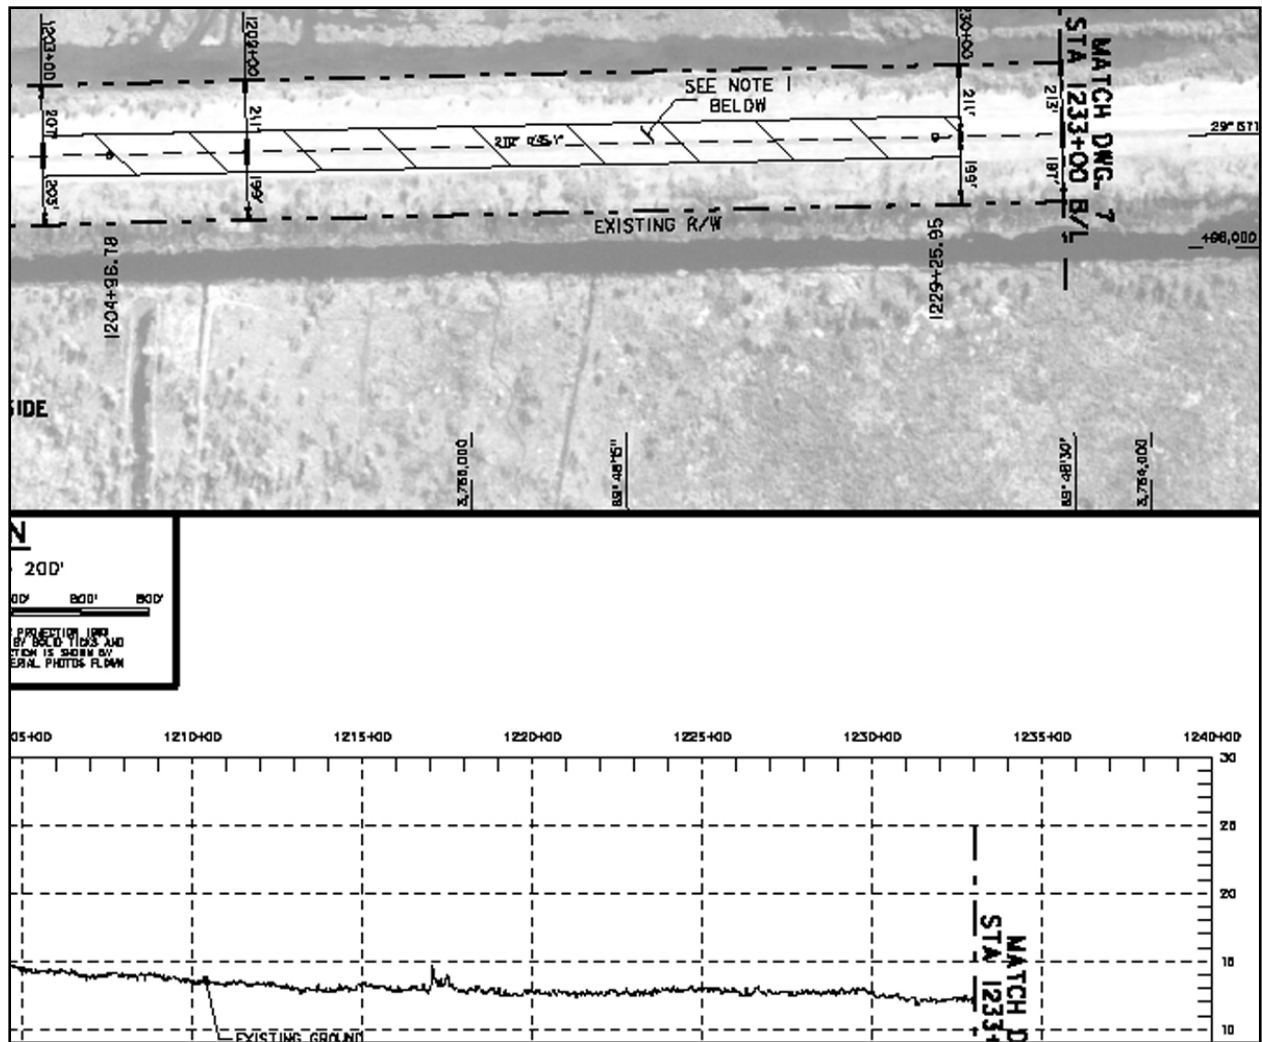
Levee Crown Elevation Drops From Elev 15 ft to Elev 12 ft in the Scour Area. Elevation 12 ft Remains Fairly Constant Along the Reach for About a Mile Beyond The Scour Section. From Contract Solicitation STB08 W912P8-06-R-0094, drawing sheet C-06
